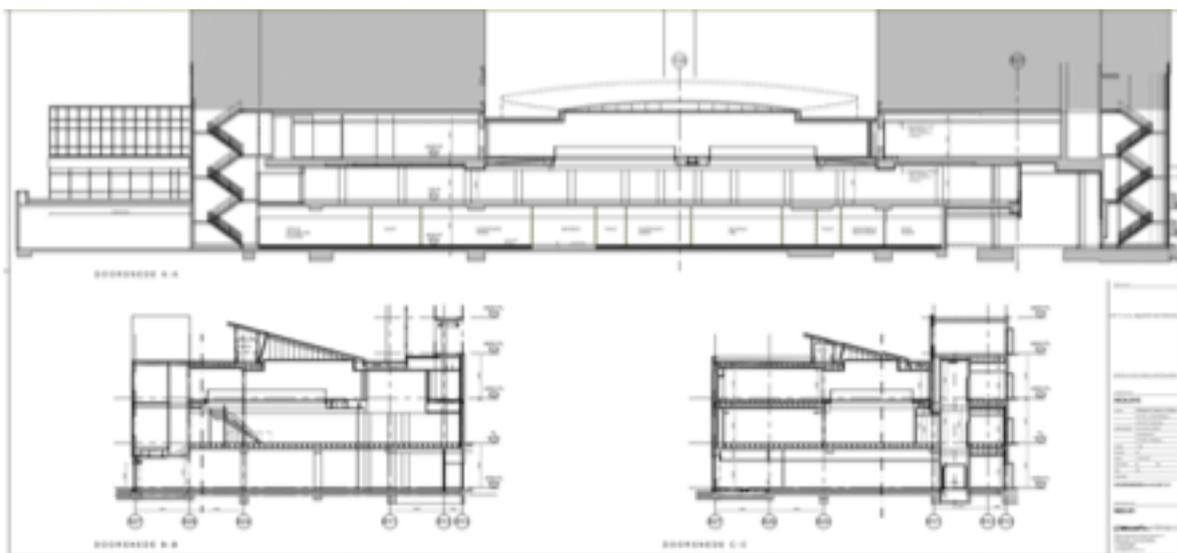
Cross-section building including canopy (CE-design, 2016)
